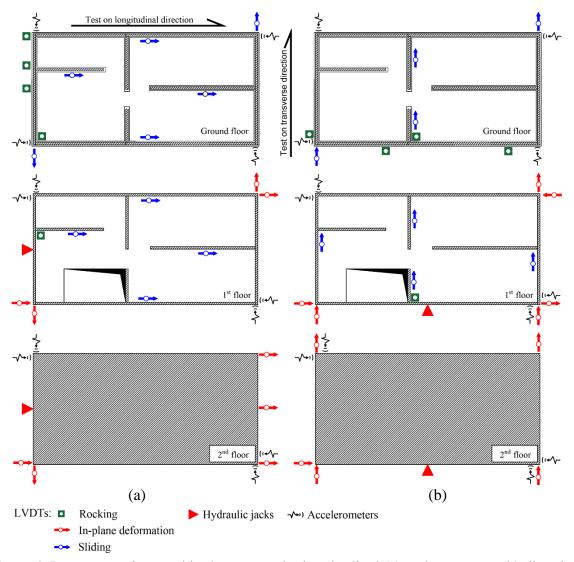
Instrumentation used in the tests under longitudinal (a) and transverse (b) direction.
